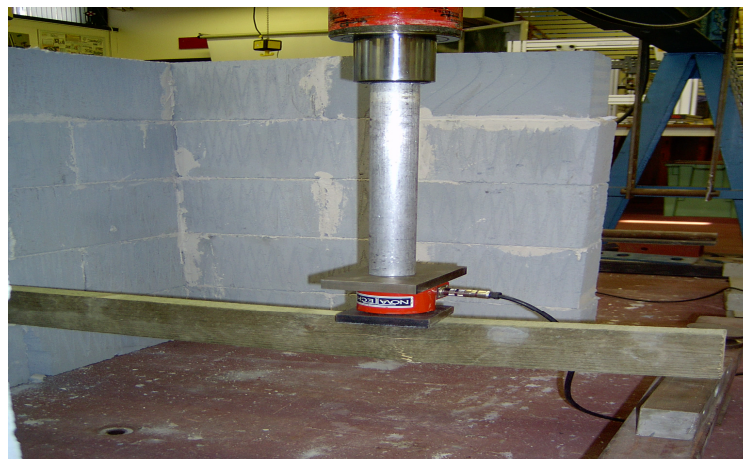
Typical Failure for all Tests Showing Timber Joist Failure
